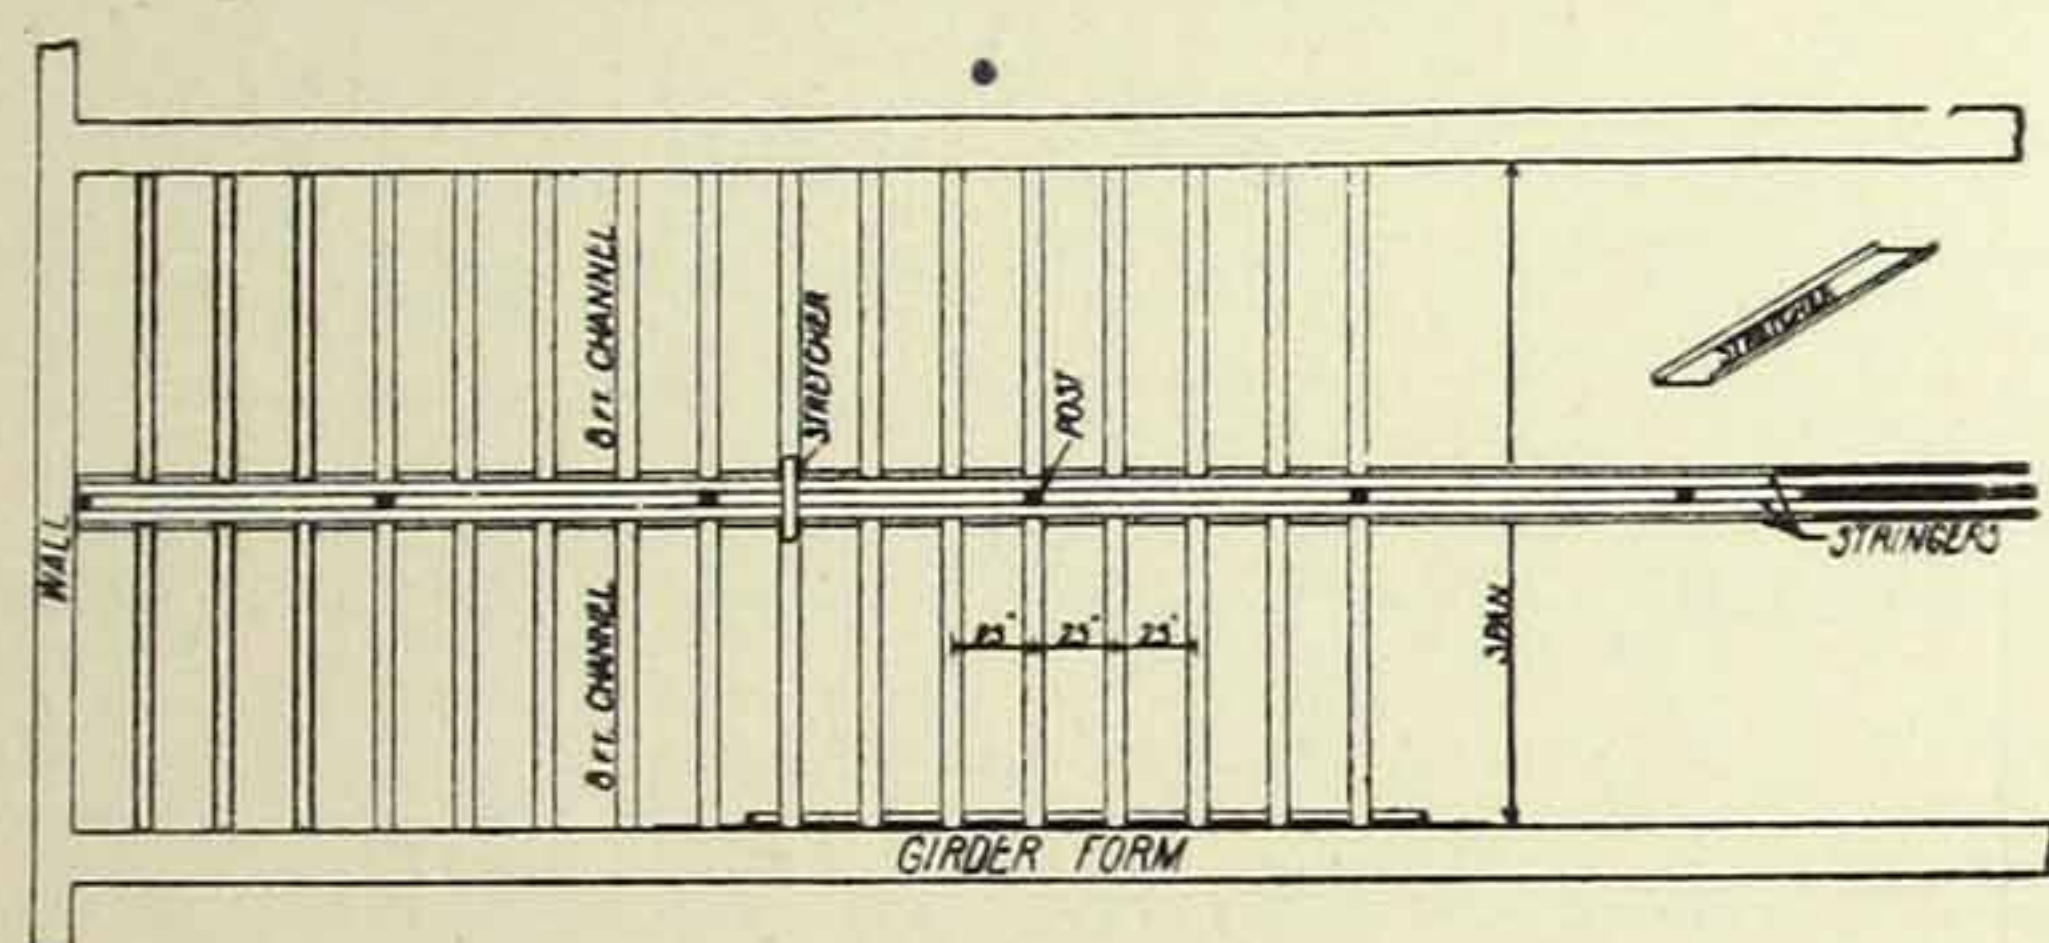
SPACING OF POSTS FOR BEAM AND JOIST CONSTRUCTION
